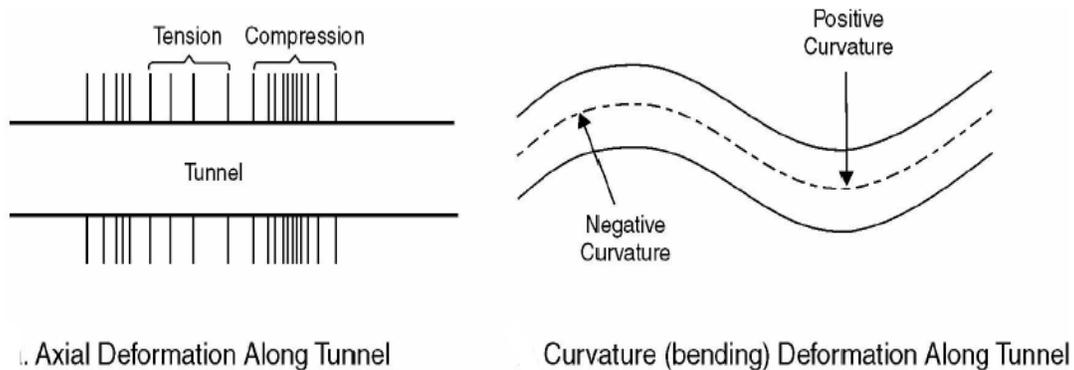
Tunnel Longitudinal Axial and Curvature Response to Traveling Waves
